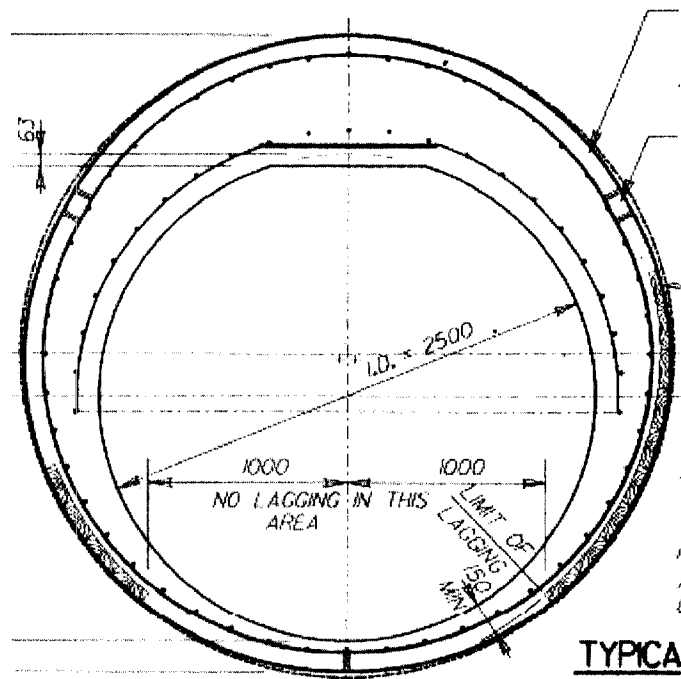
Typical cast in place reinforced concrete lining (City of Edmonton)
